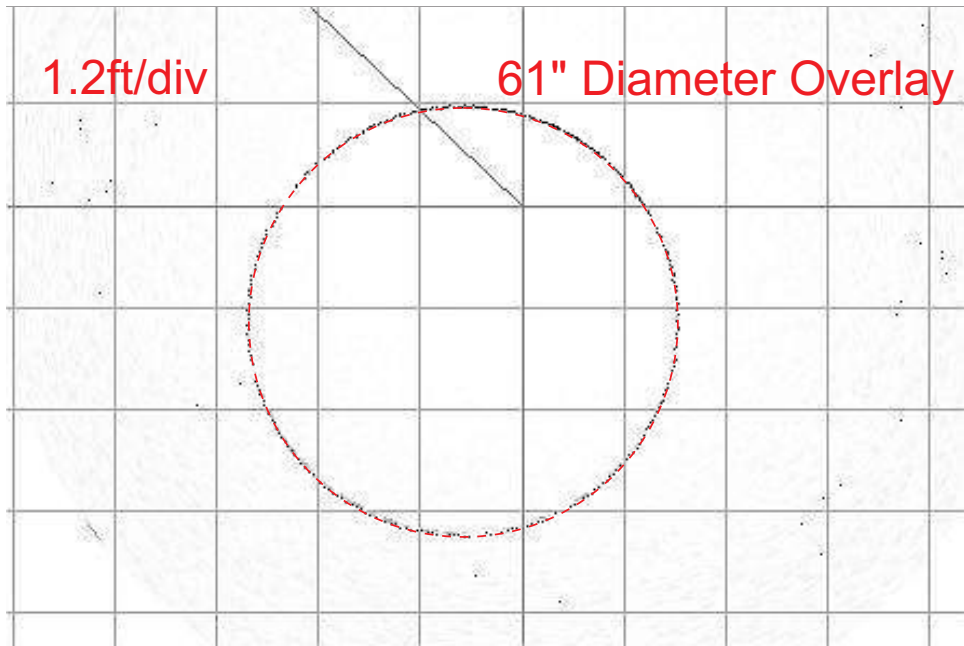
A-5: Sonar Profile 5 - 104 feet downstream of Manhole 1.
